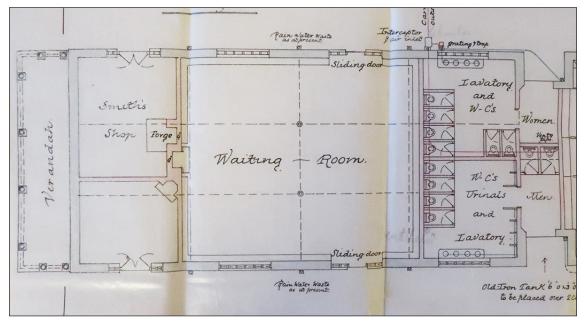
Ground-floor plan of the waiting room to the west, with lavatories to the east, a waiting room, a smith's shop at the north-west and an office at the south-west, Price & Wooler, 1898. [Original held at Somerset Heritage Trust, SHC D/B/wsm/24/1/629]
